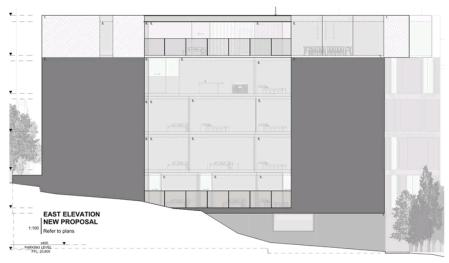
The Eastern Elevation of the proposed development (Source: Room11 Architects).
